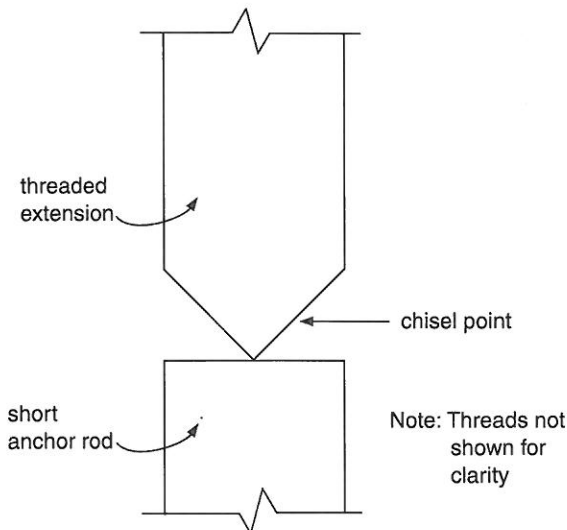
Beveled end of threaded extension to be welded to short anchor rod.
